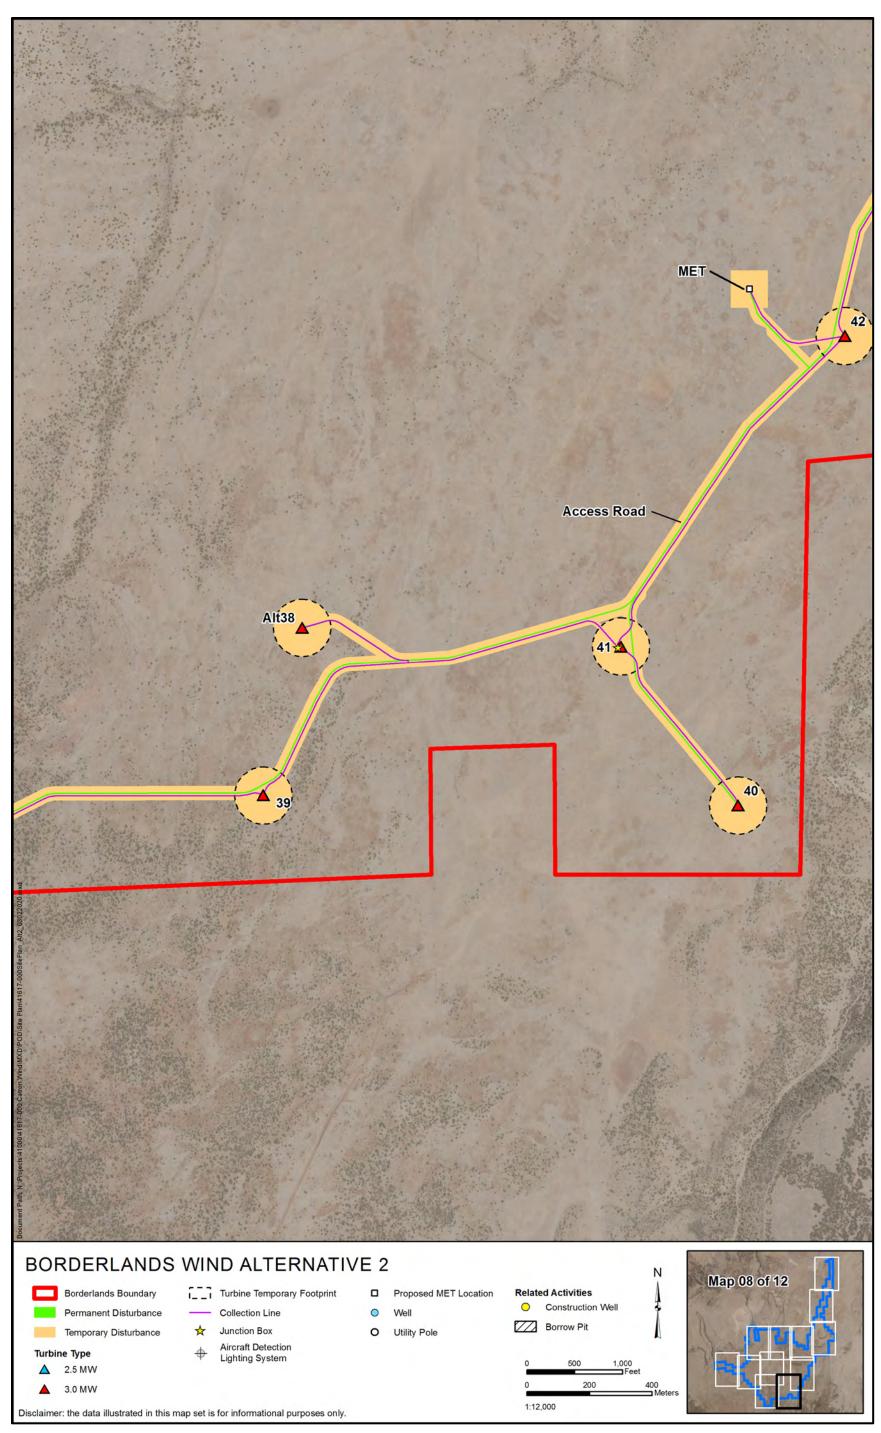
Alternative 2 Site Plan (Map 8 of 12)
